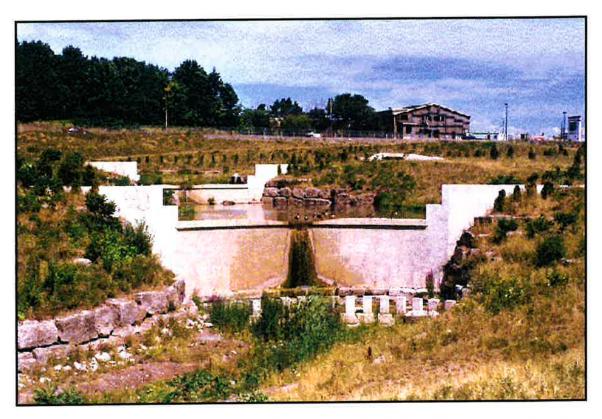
Looking upstream at the ponds and drop structures from the Brant Street ramp to 403 west
